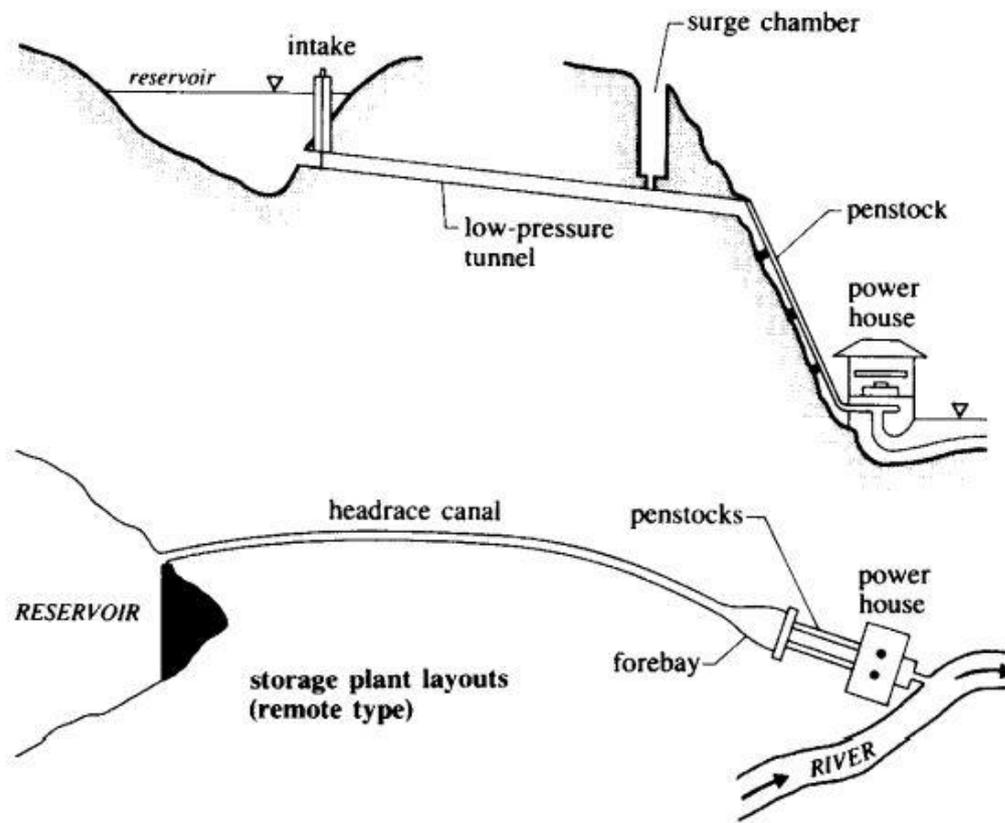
Typical Layout of a Storage Plant (P. Novak et al, 2004)
